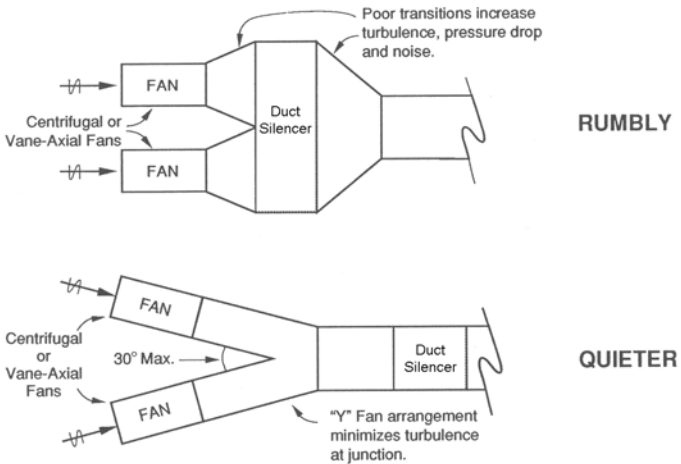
Examples of rumbly and quieter parallel fan installations.
